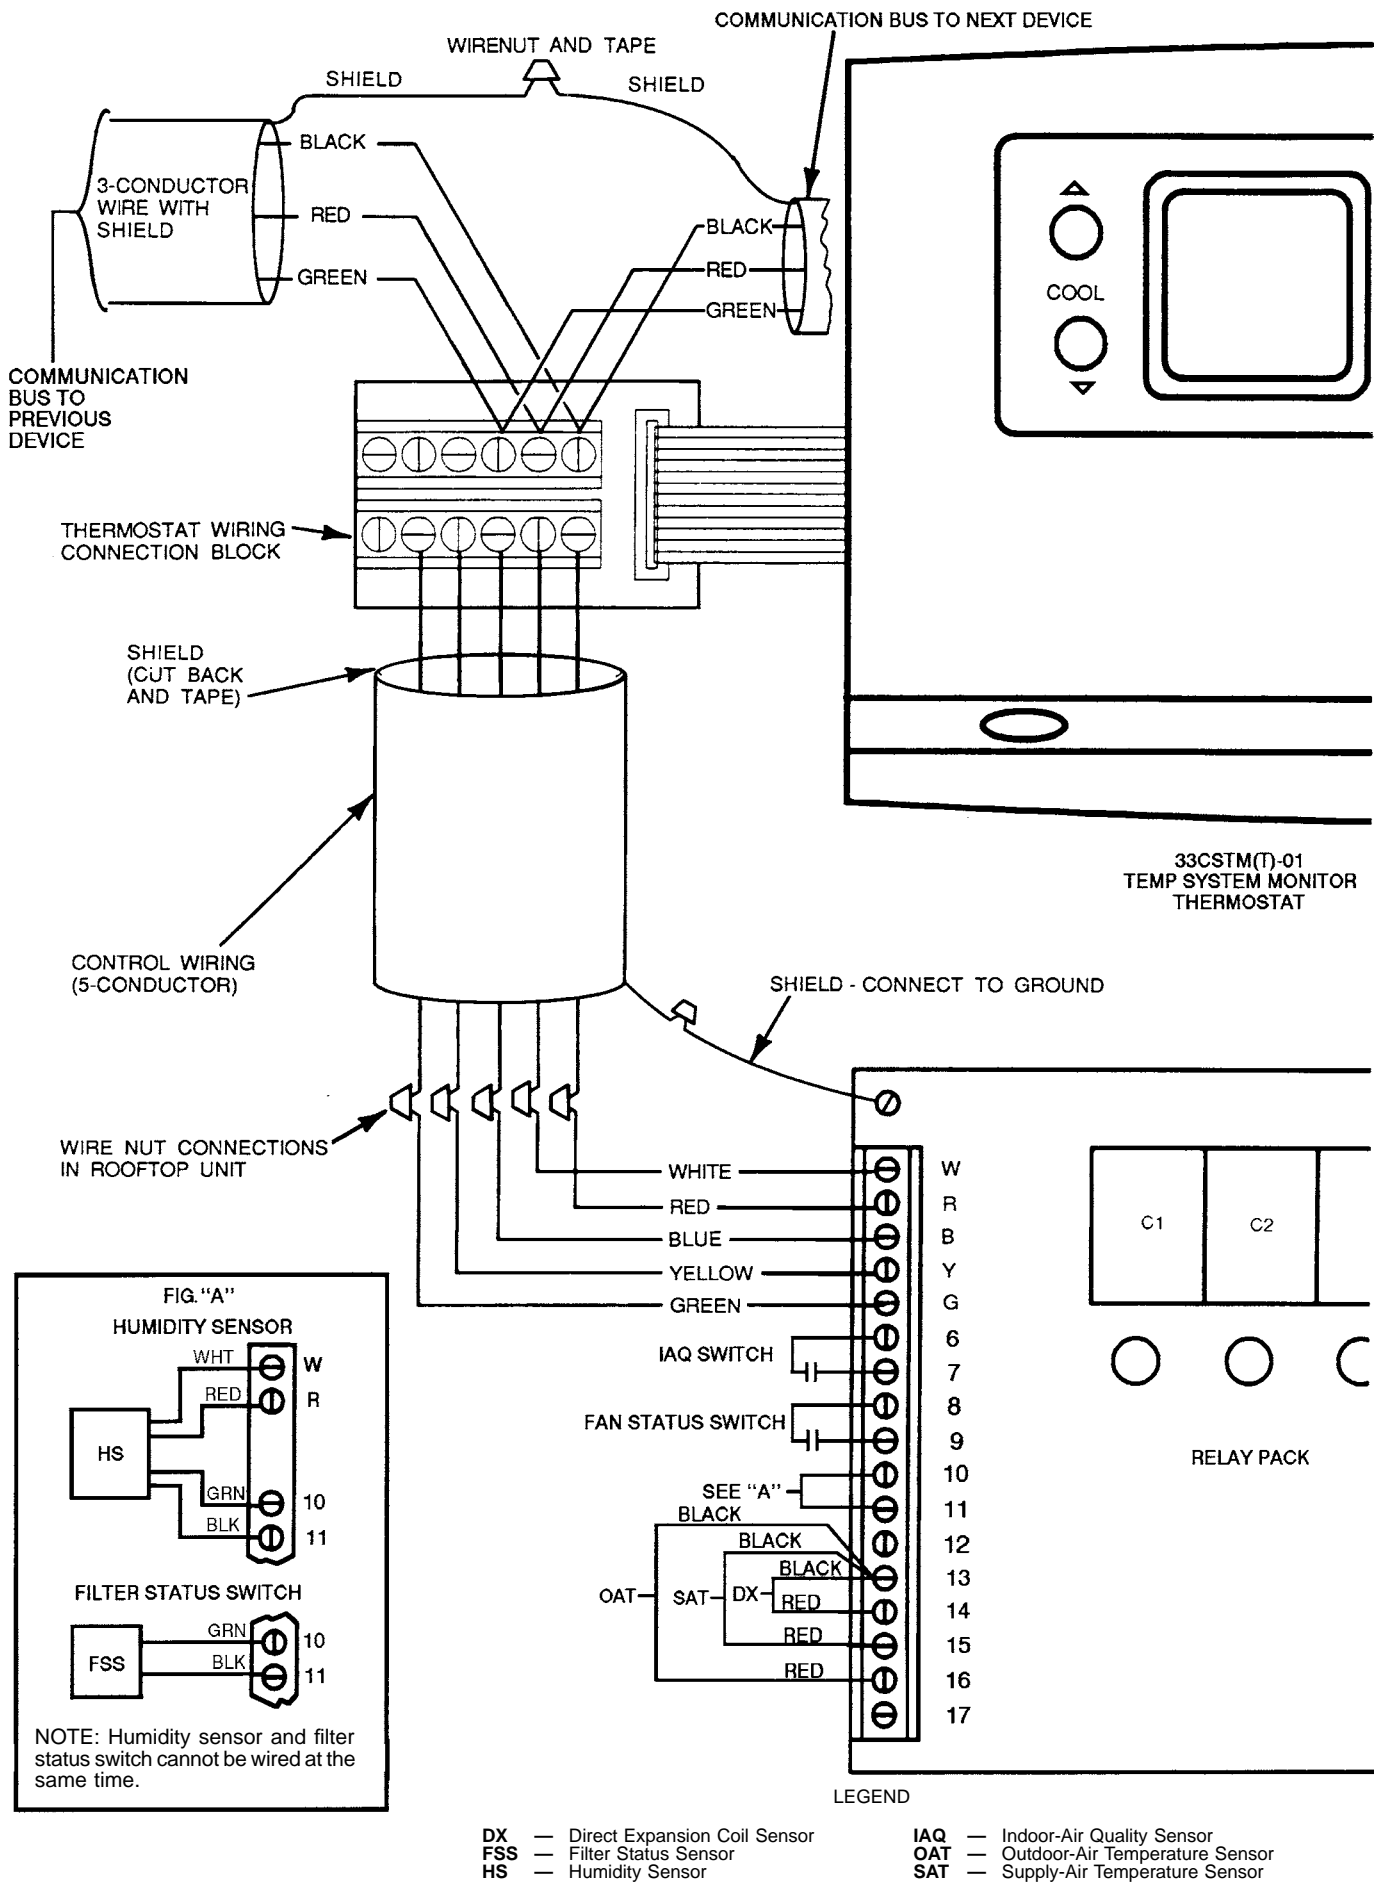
Relay Pack to Thermostat and Sensor Wiring
